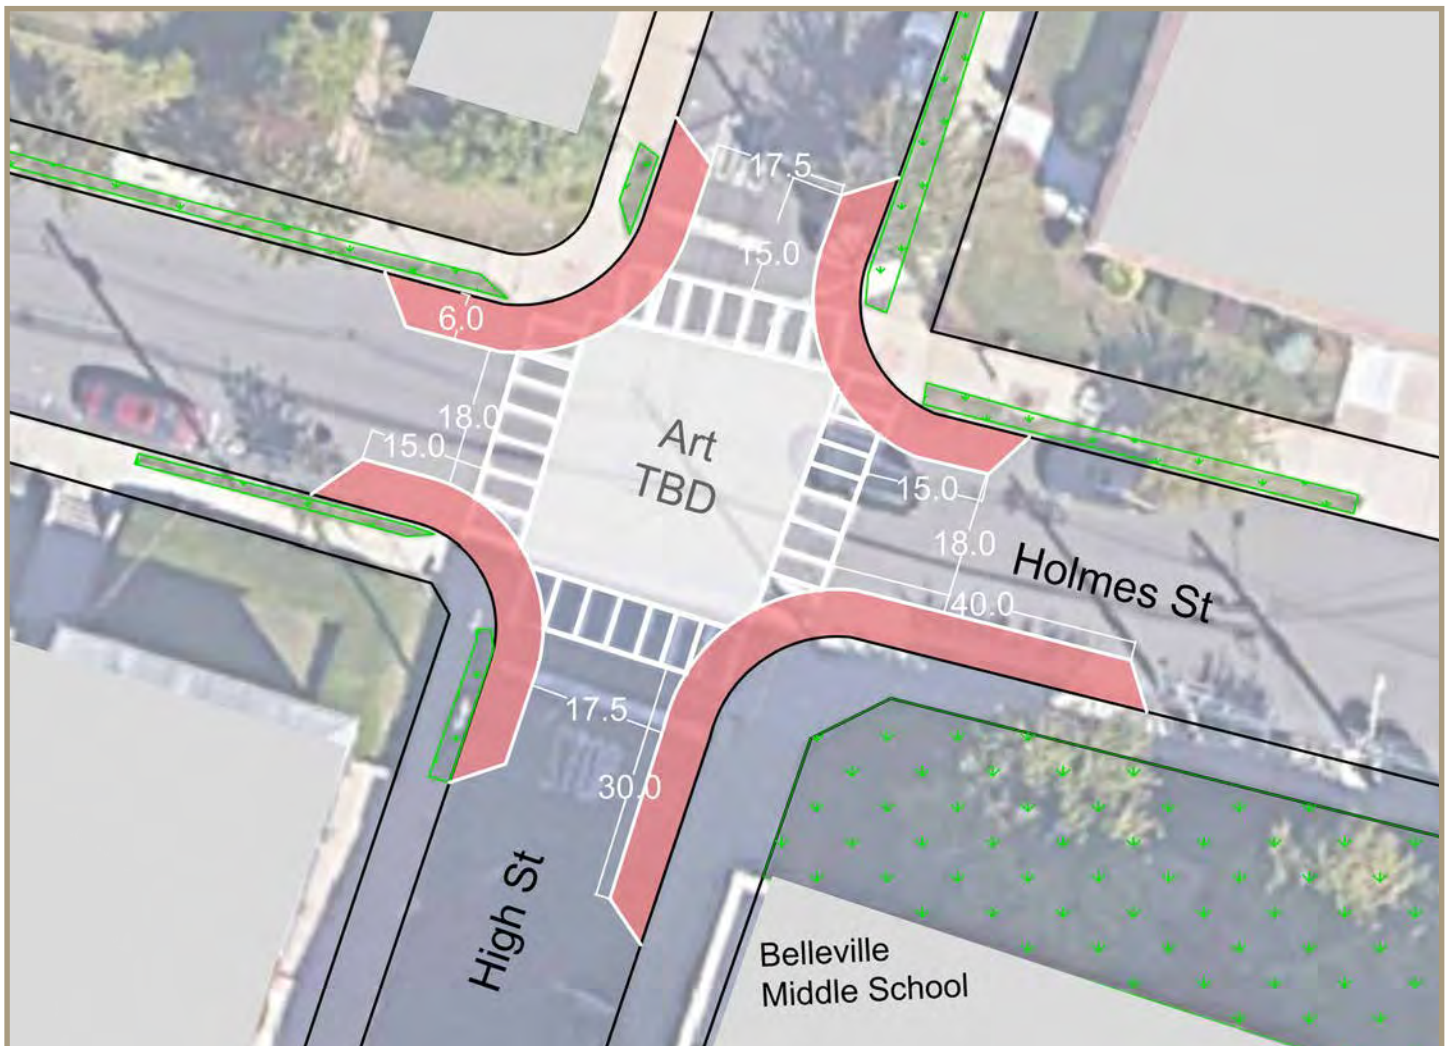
Alternative A, curb extensions at the intersection of Holmes Street and High Street.
